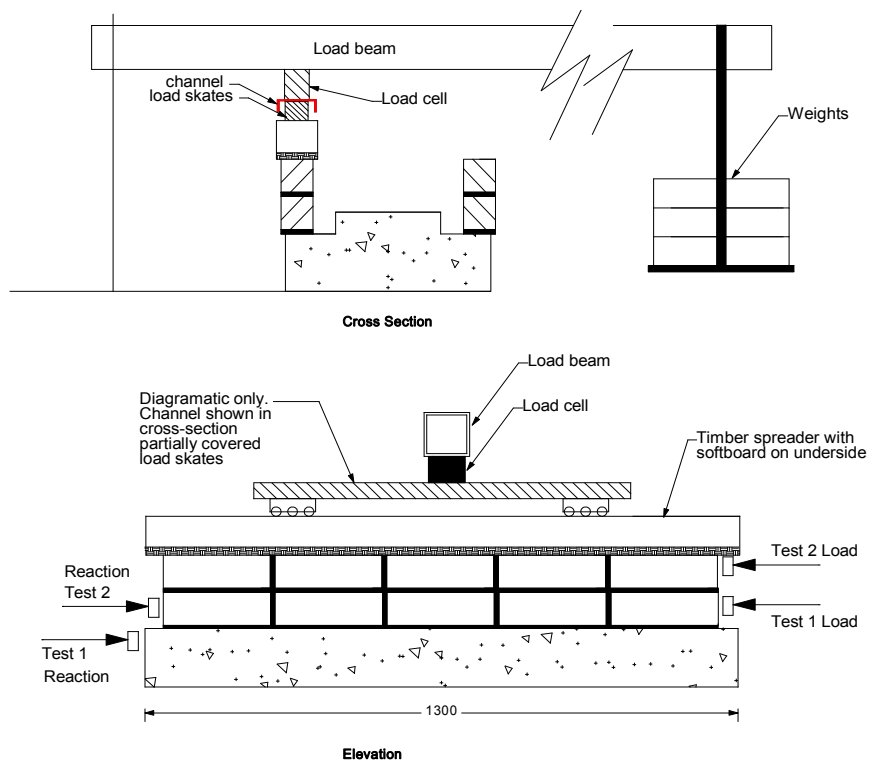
Shear test set-up for both brick-to-brick and brick-to-foundation tests
